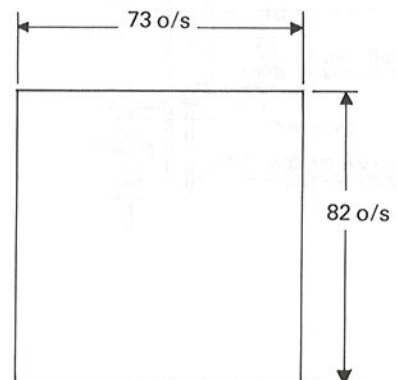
Outside Dimension of Fan Outlet - Type 2.
